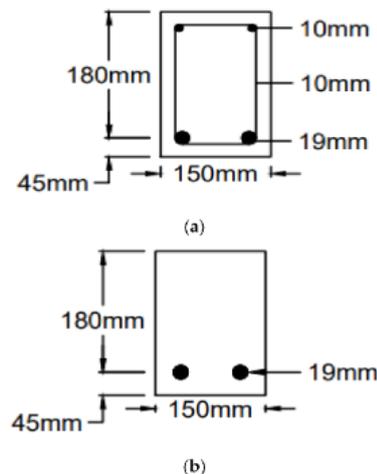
(a) Cross-sectional details of beams (a) with shear reinforcement and (b) without shear reinforcement, and longitudinal sectional details of beams
